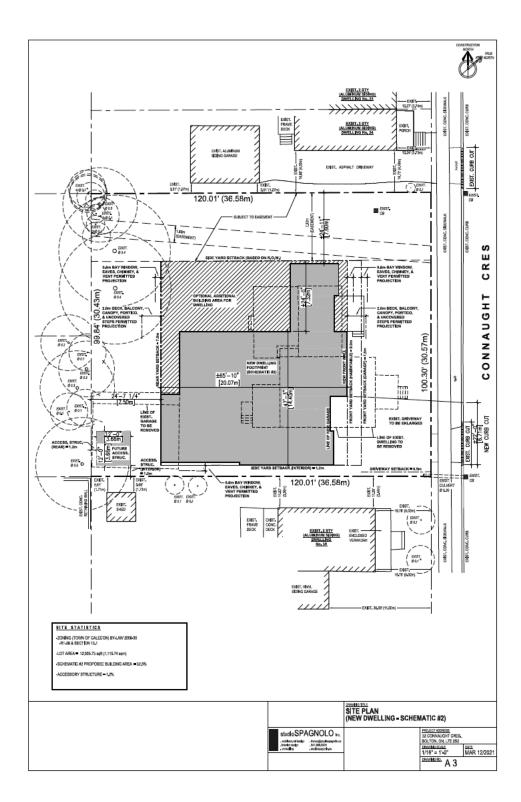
Proposed concept site plan, option 2. Provided by Studio Spagnolo Inc.
